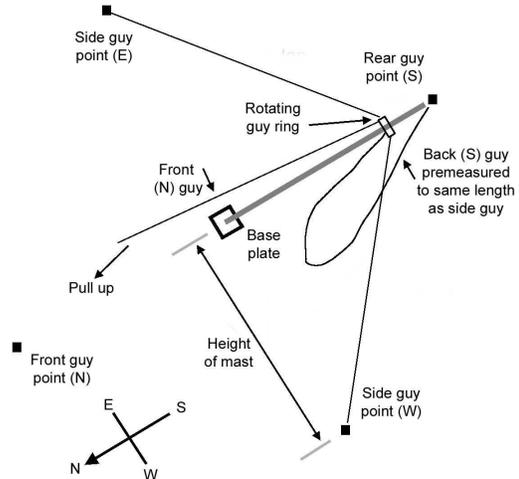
Basic guying arrangement for simple small mast (plan view)
